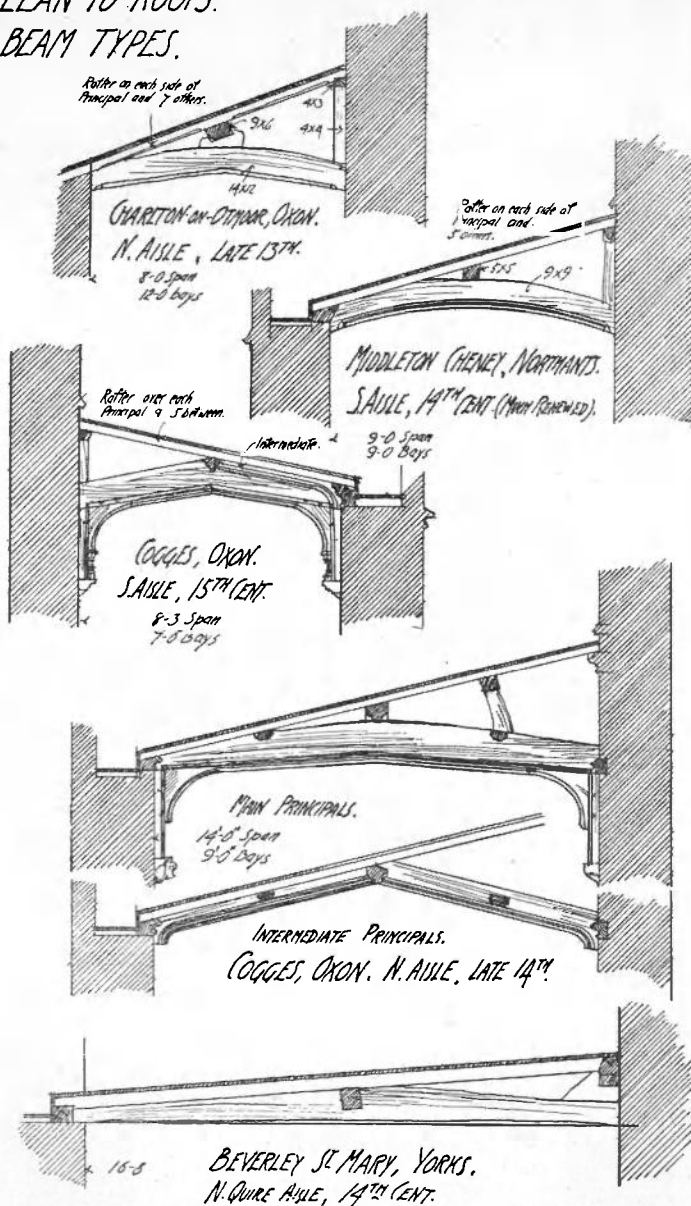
LEAN-TO POST-AND-BEAM ROOFS.
